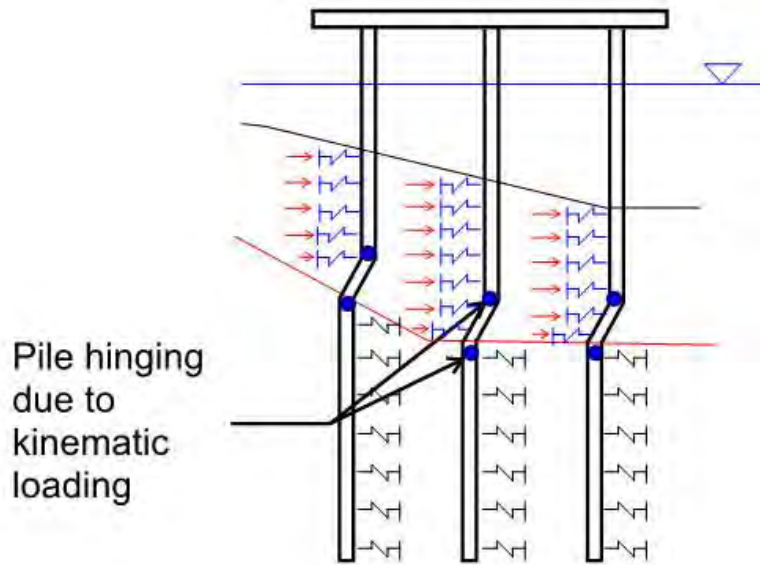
Typical Pile Hinge Locations for Kinematic Loading
